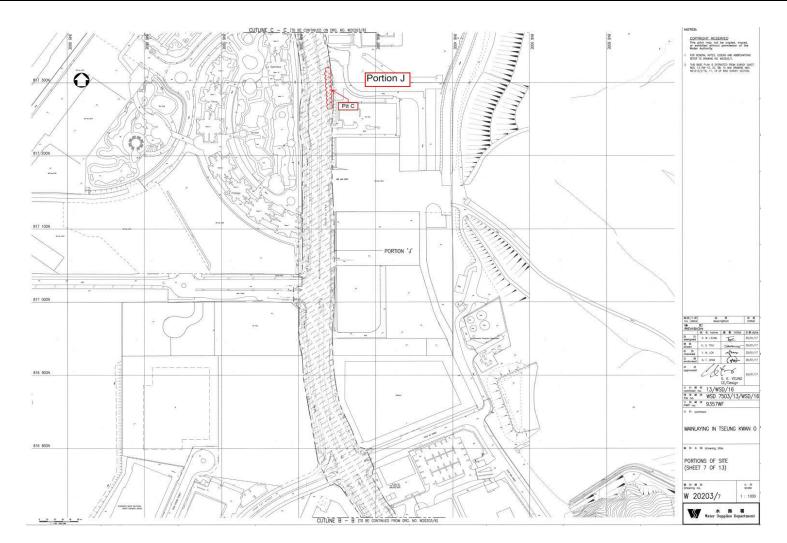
Location Plan for Portion J – CH.A 19+15 to CH.A 19+50 (Pit C)
